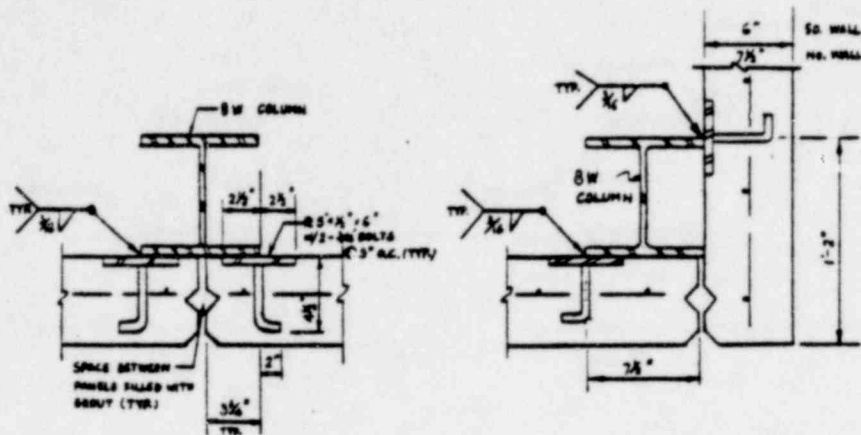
TYPICAL WALL PANEL CONNECTION DETAILS
